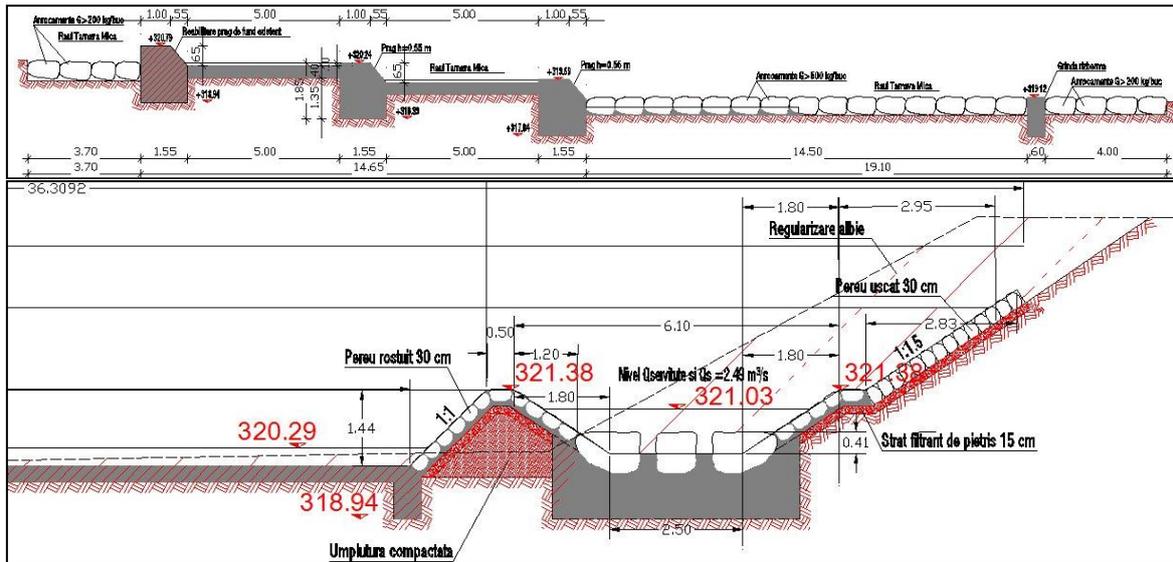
Longitudinal profile by the triple step arrangement and detail cross-section by the first concrete casted three-stone row on the fish passage
